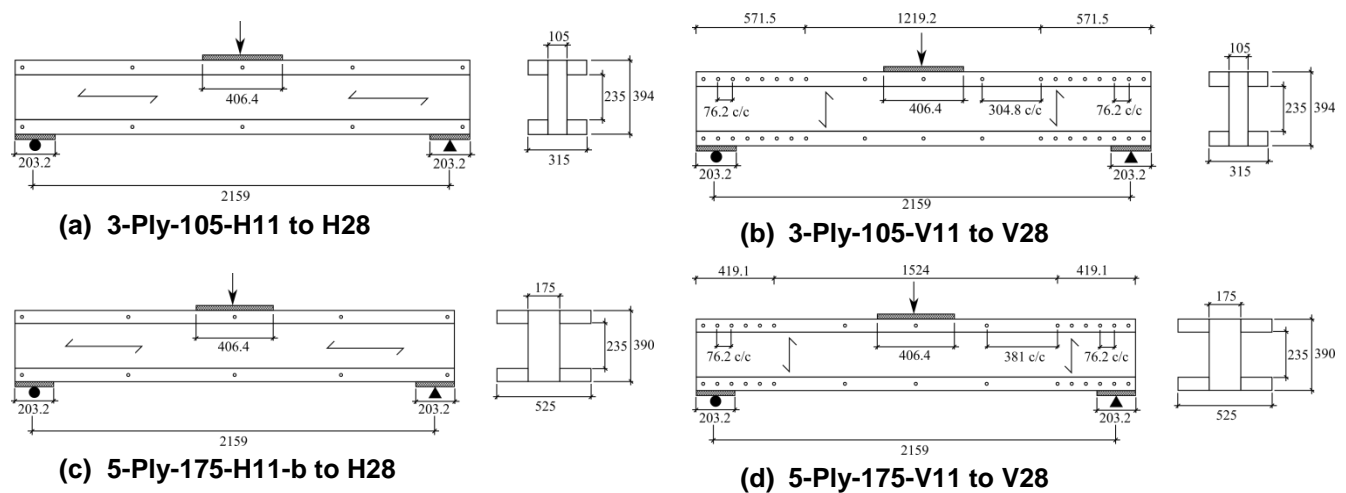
Three point loading shear test set-up and reinforced CLT beam with glulam dimension for specimen received in January 2016
